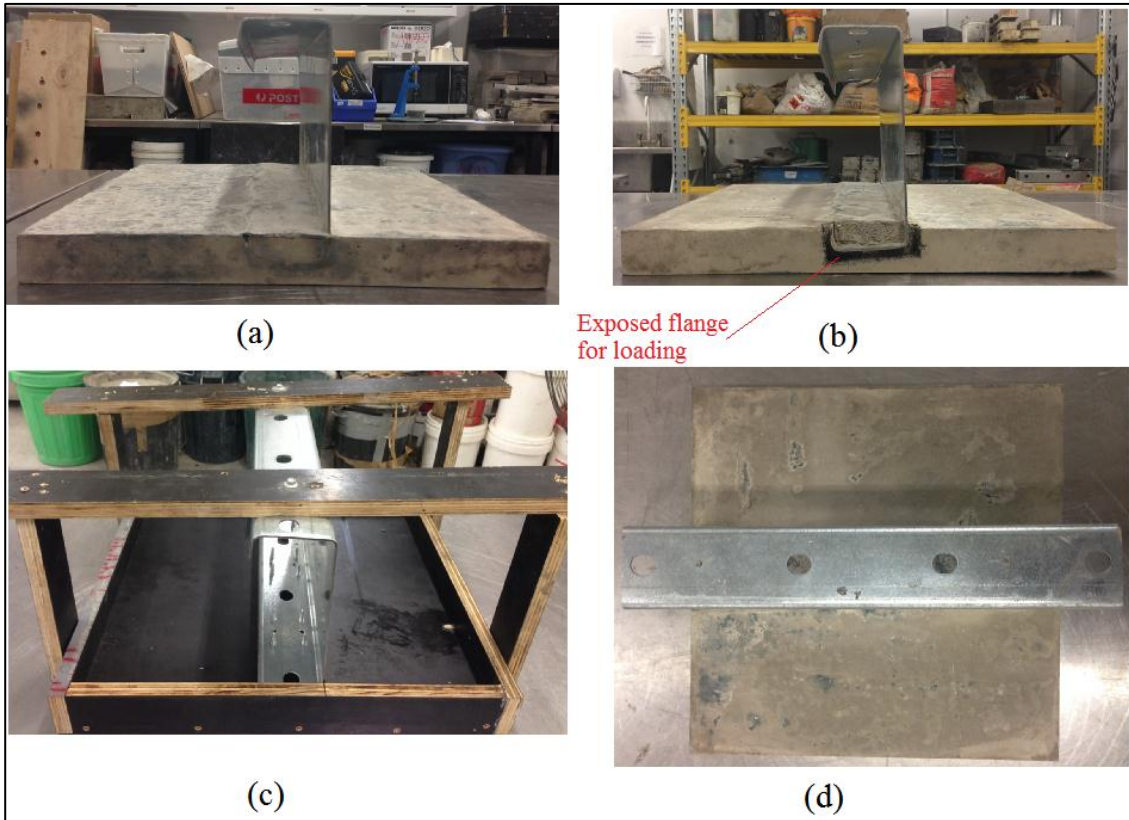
Photographs of the small-scale specimen used for push-out shear test:
